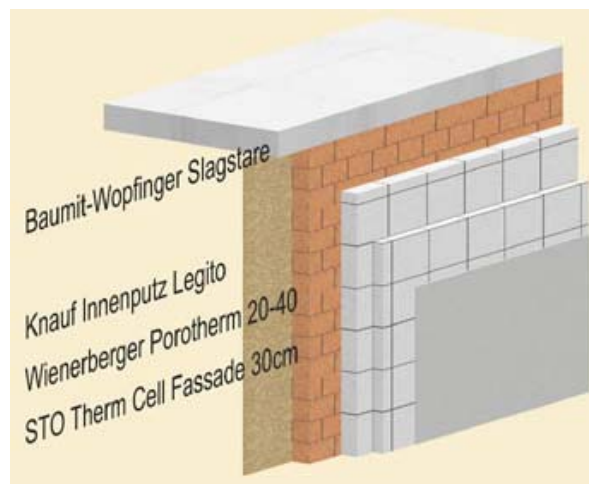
Insulated brick wall construction: Therm Cell® mineral foam board (STO), Porotherm® brick masonry (Wienerberger), Legito® interior stucco (Knauf), Slagstare® cement-free concrete (Baumit-Wopfinger).
